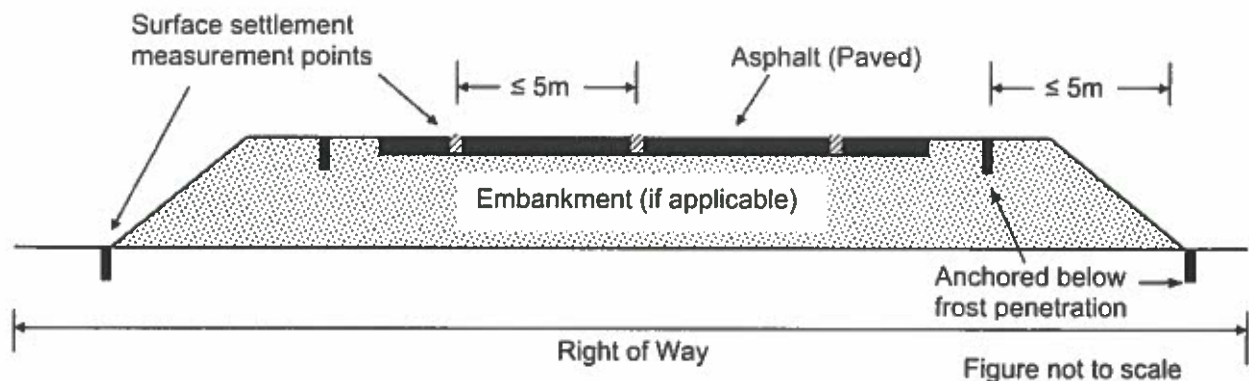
Typical configuration of surface settlement monitoring points along the tunnel alignment.
